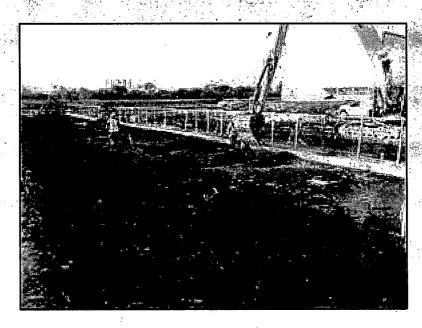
Initiated excavation of the anchor trench west of the SCCC CA.
